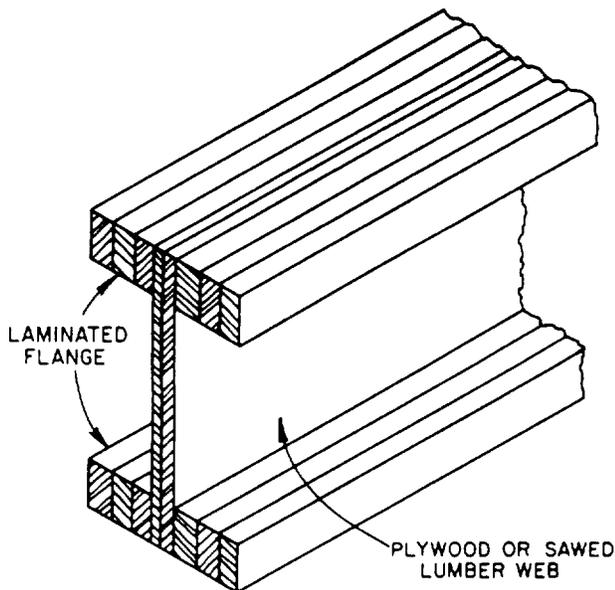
Laminated and sawed lumber or plywood beam.
